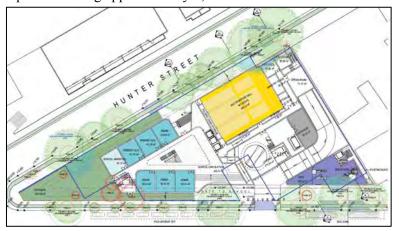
The proposed ground level development plan for the site. (Source Ground floor plan, from 20621 Presentation by SDG Dated 25.10.2023).
